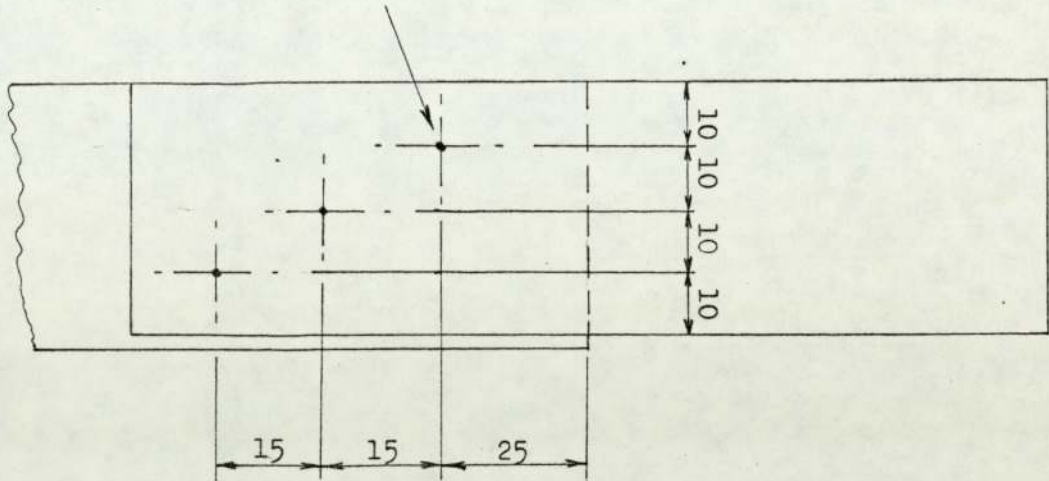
EDGE-BEAM JOINT TYPE B
